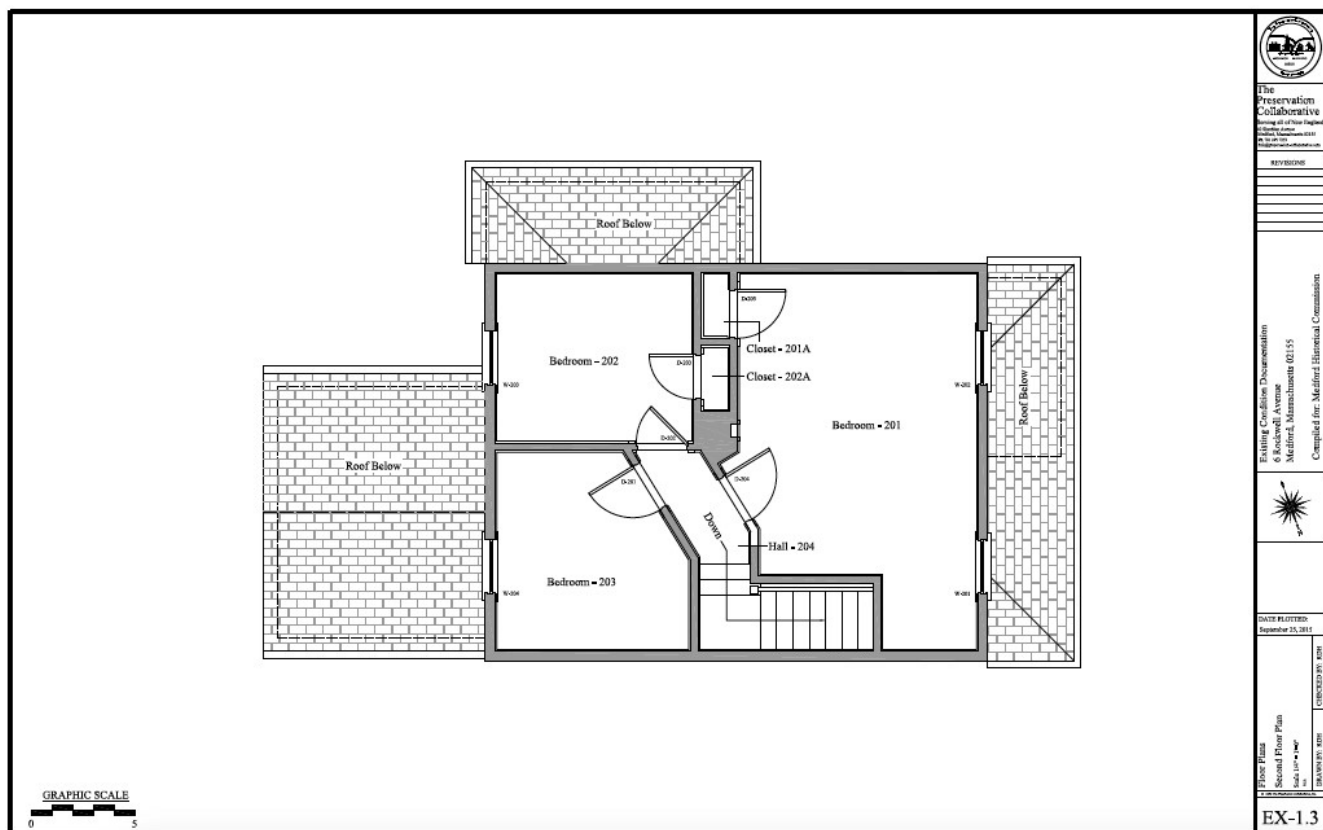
Plan of the second floor, existing conditions. Drawing by Ryan Hayward.
